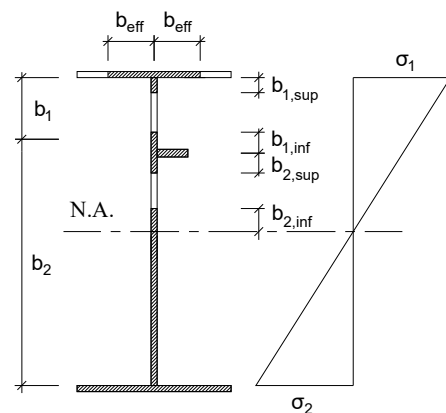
Effective cross-section of girder<sup>[2]</sup>
